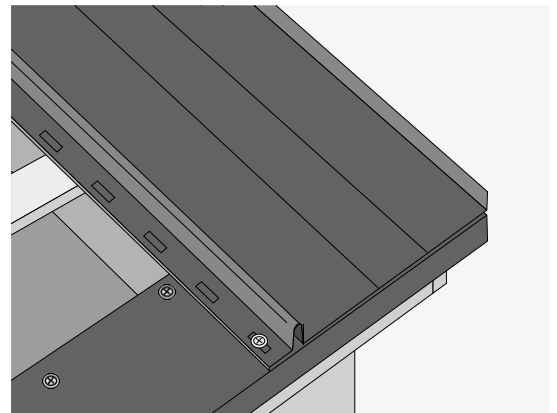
FASTENING THE ROOF PANEL AT THE EAVES
